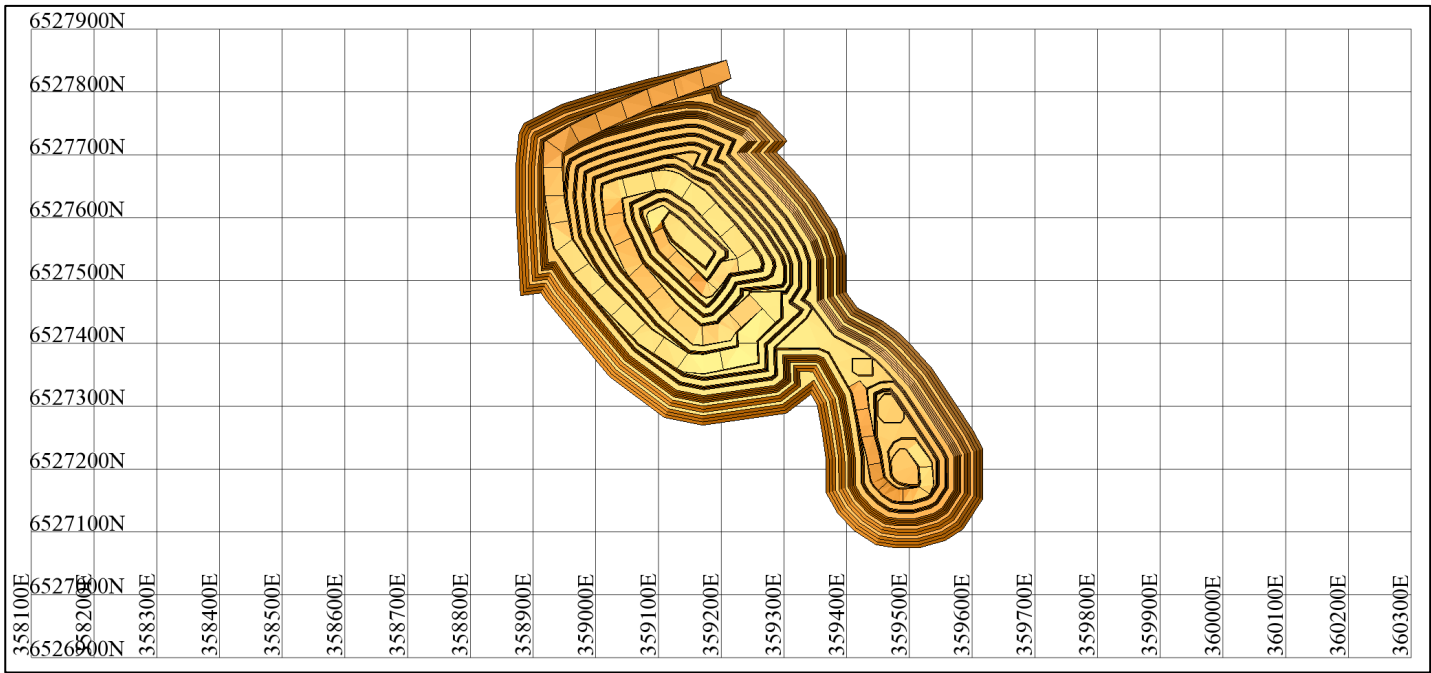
Theia stage 3 pit design – Plan view - Production Case
